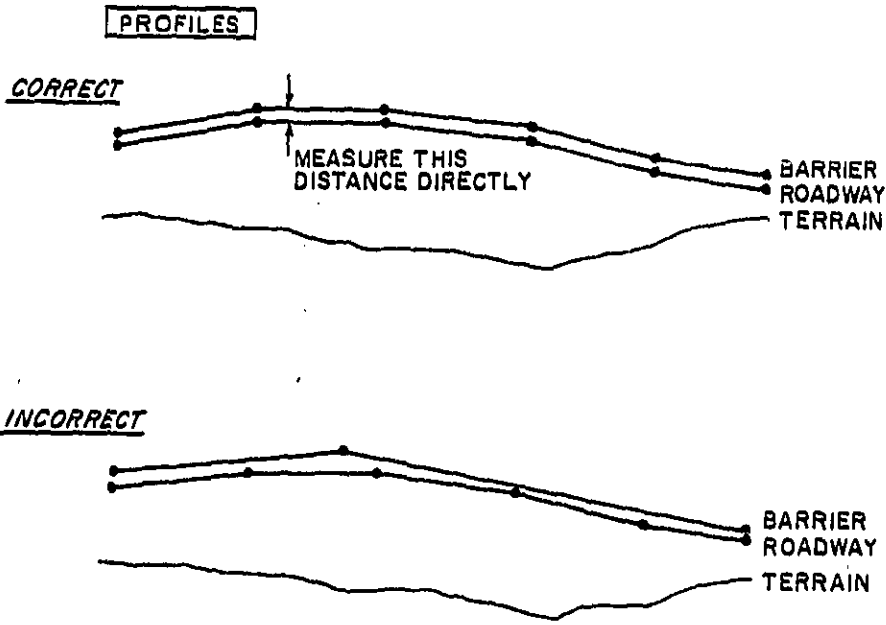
PRECISE BARRIER ELEVATION - RELATIVE TO ROADWAY
